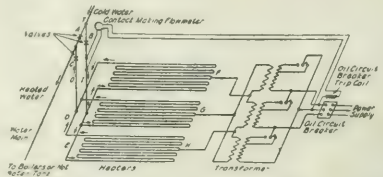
HYDRAULIC AND ELECTRICAL CONNECTIONS OF HEATER.
